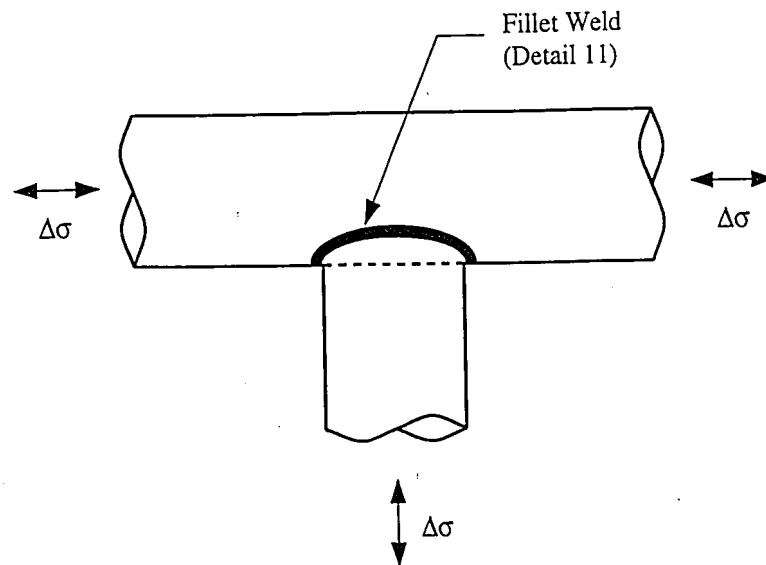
Fillet-Welded Tube-to-Tube Connection.
